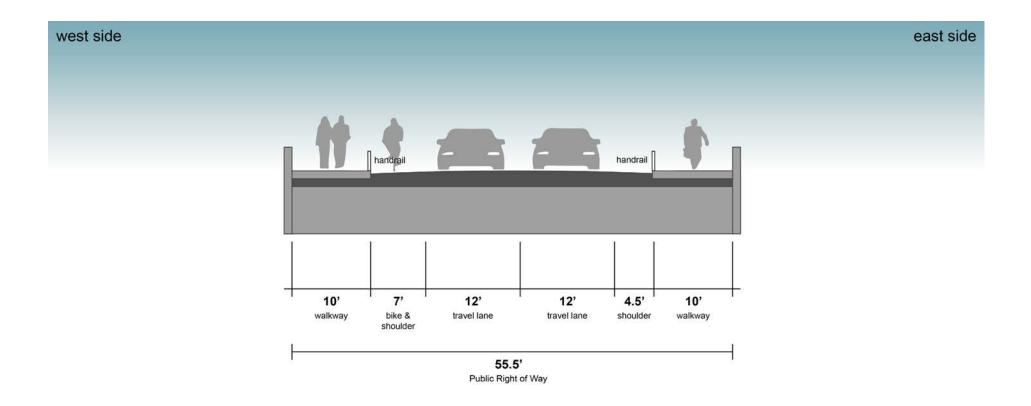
SECTION L: SQUAW VALLEY ROAD BRIDGE
